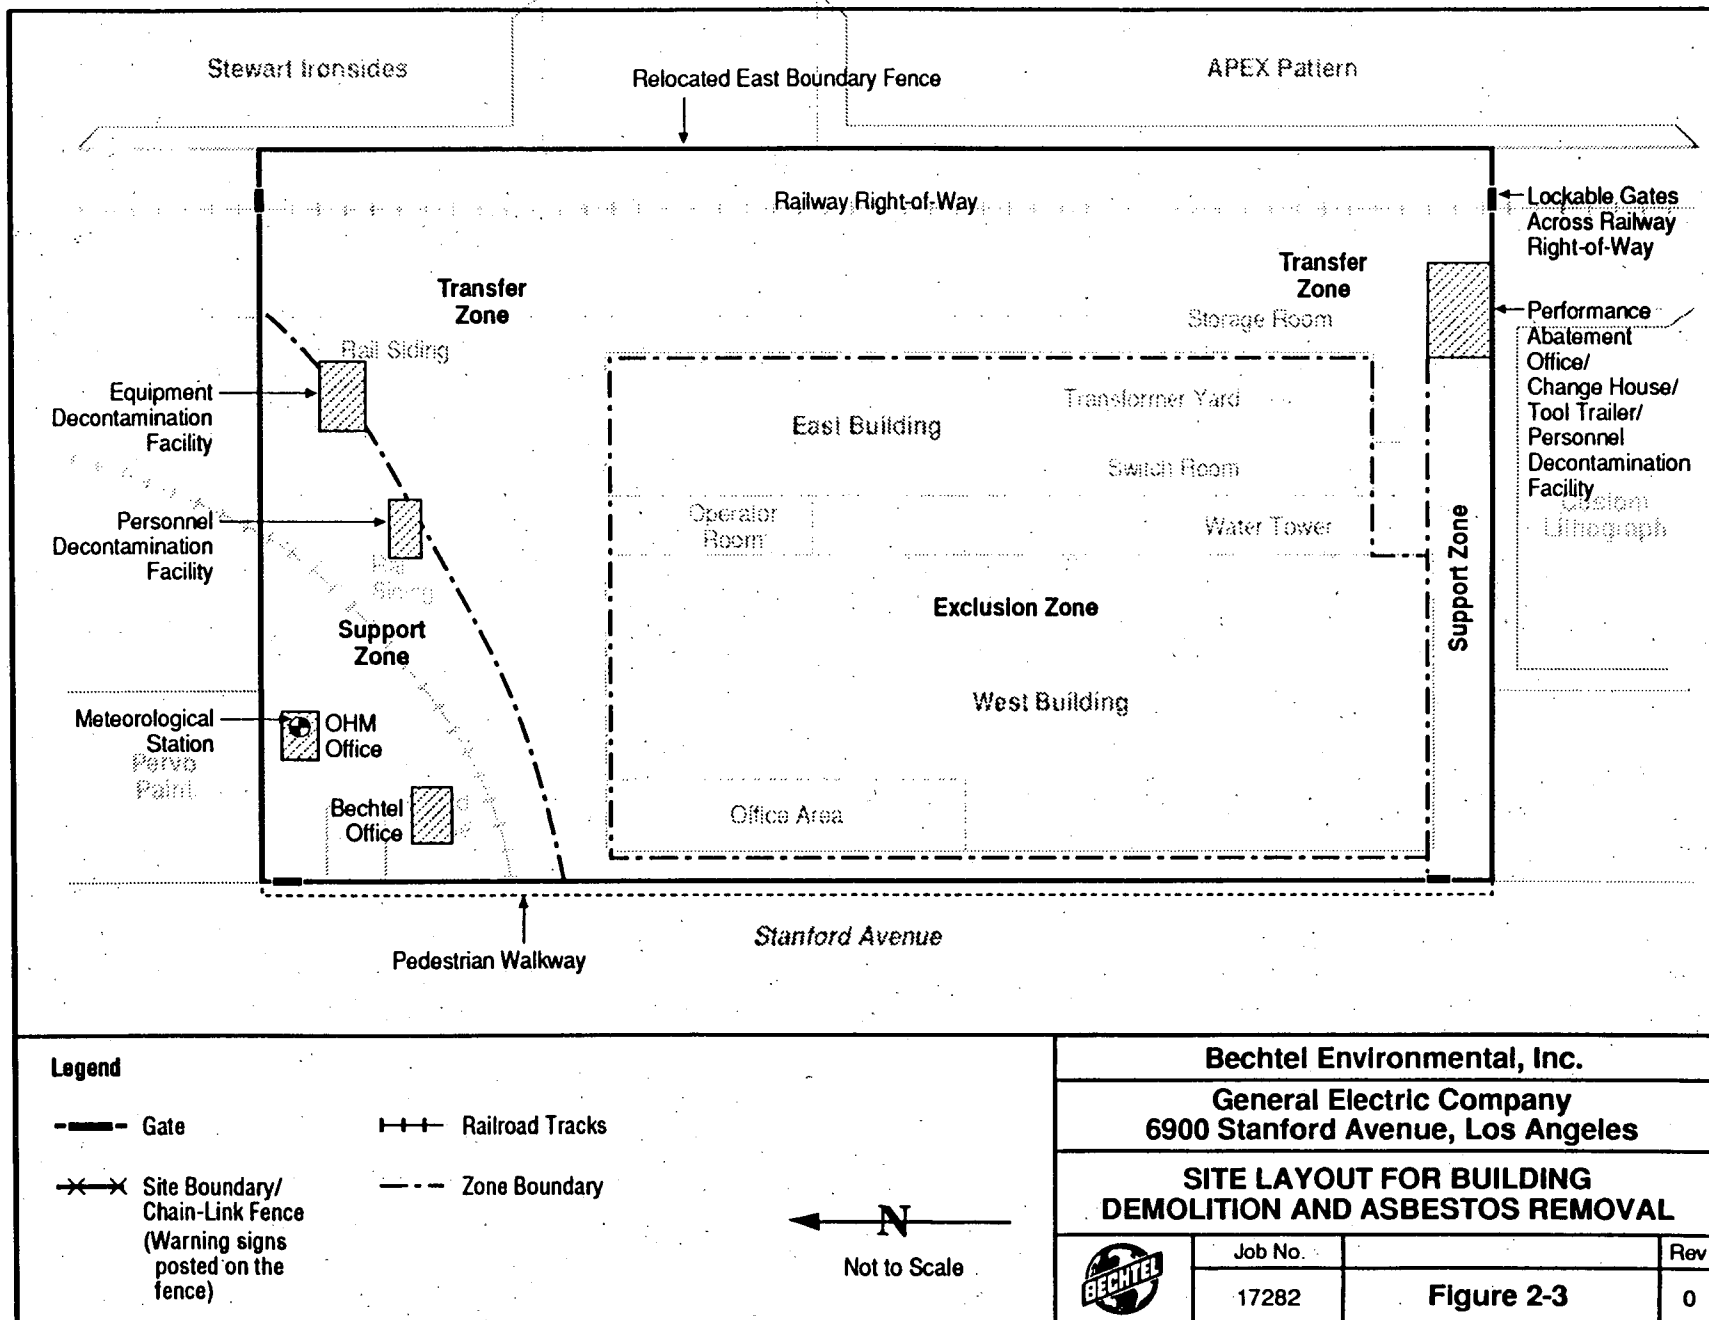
shows the site layout during building demolition and asbestos removal activities.
